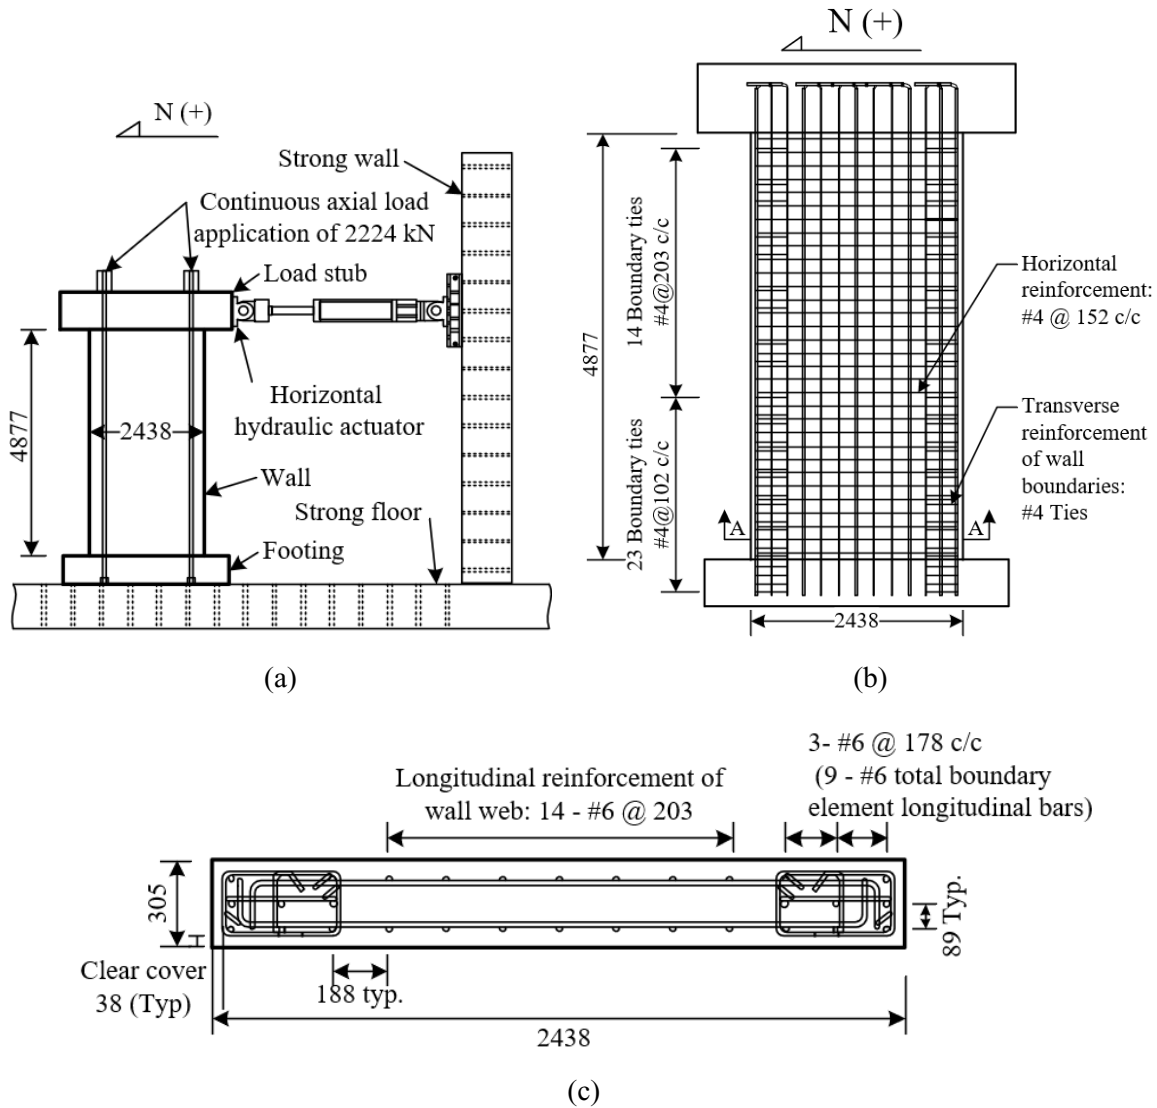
Experimental test on the slender wall by Faraone *et al.* (2019): (a) schematic test set-up; (b) reinforcement details in elevation; and (c) cross-sectional reinforcement details
